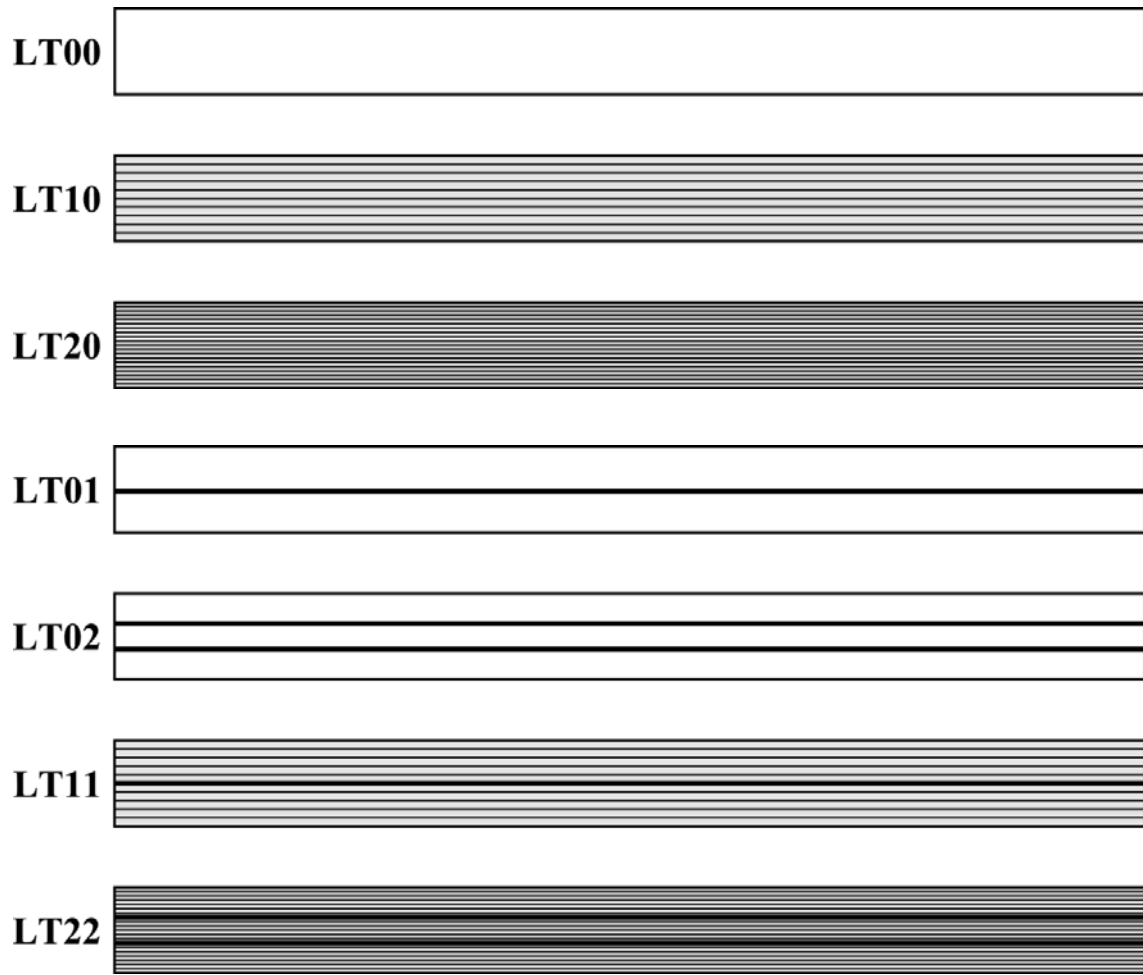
Geometry and reinforcement details of test specimens (dimensions in mm)
